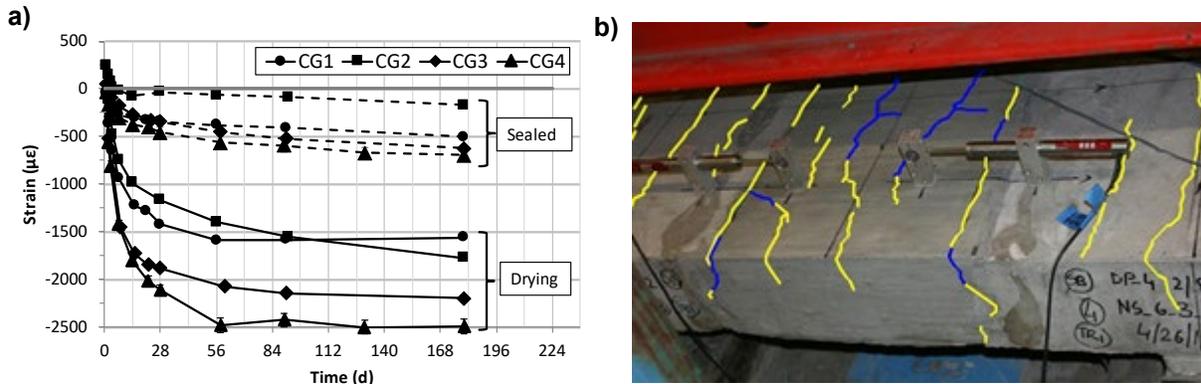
(a) Measured autogenous (sealed) and drying shrinkage of four commercially-available cementitious grouts (adapted from (4)), (b), Grout-concrete connection showing shrinkage cracks (blue lines) and mechanical loading cracks (yellow lines) (6).
